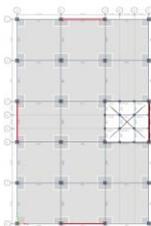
Model 2: Flat slab structure with shear wall provided at edges
